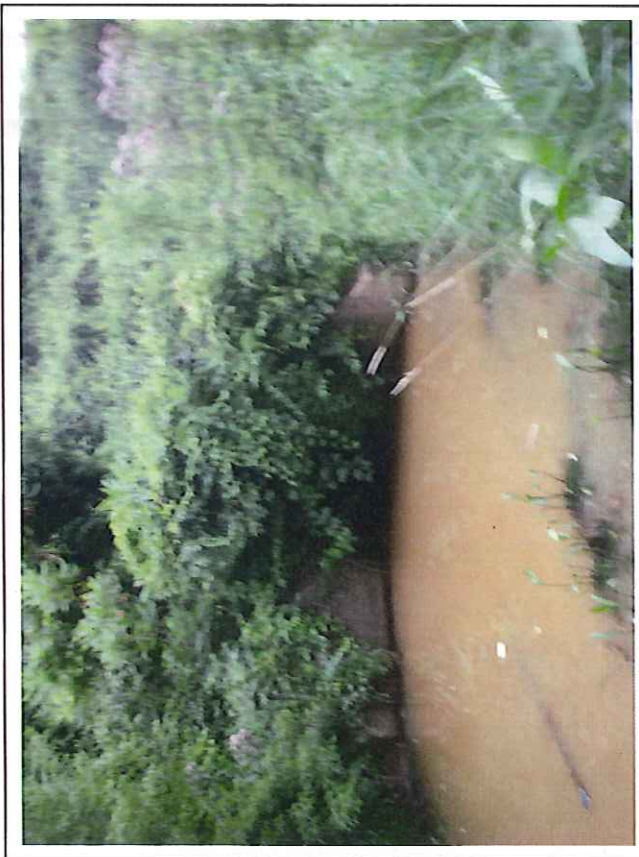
General View, Inlet elevation. (West) Note Heavy vegetation.
